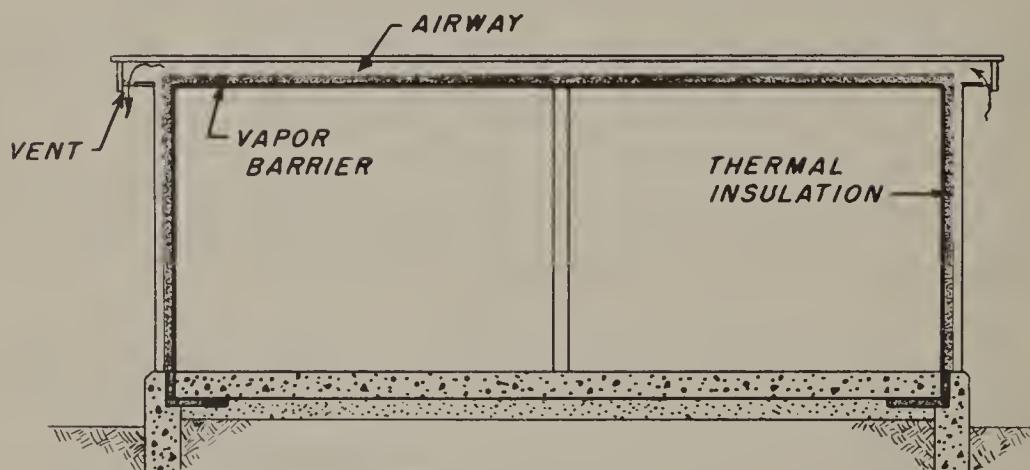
One-story, flat-roof house.* Condensation control is obtained by means of a vapor barrier in the walls in condensation zones I and II and in the ceilings of zones I, II, and III. Ventilation should be provided between the thermal insulation and the roof deck in all zones. Thermal insulation should be used in zones I and II in the walls, and in the ceilings in zones I, II, and III. It should be applied also at the junction of the footing wall and the concrete floor slab to break up the continuity of the concrete.
